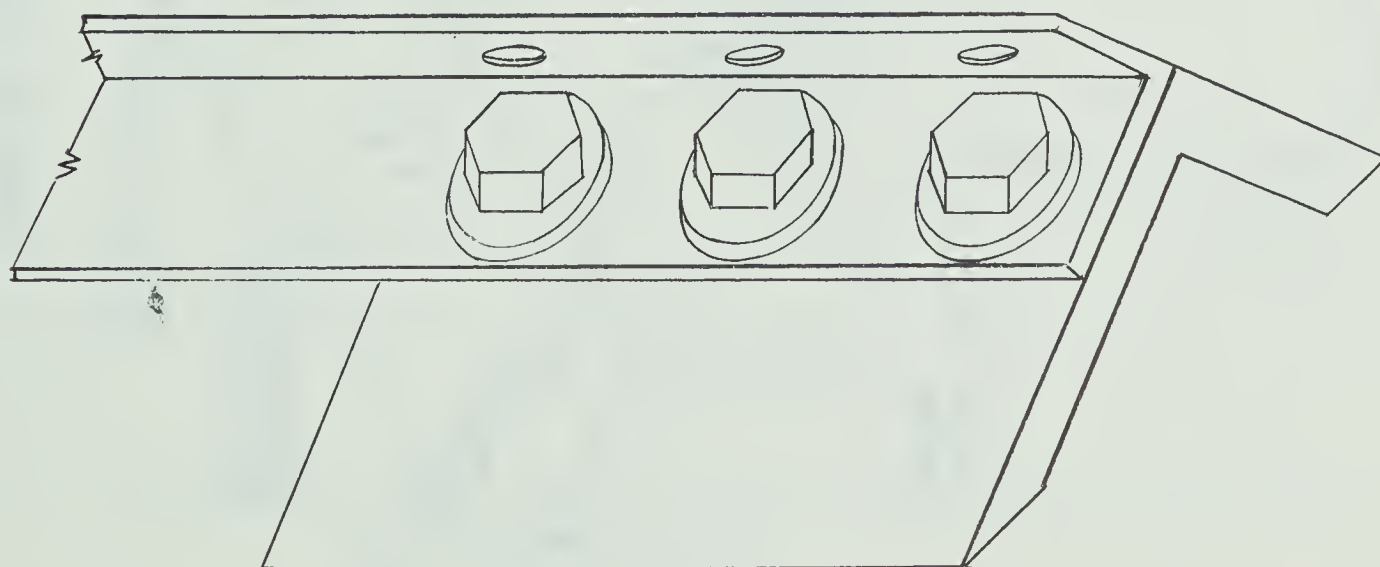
SHORT LEG CLAMPED - OBLIQUE VIEW
